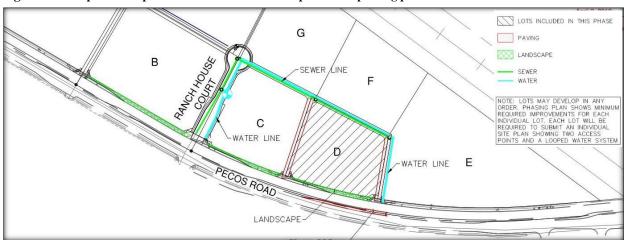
Excerpt from Depot at Power Ranch off-site improvement phasing plan
